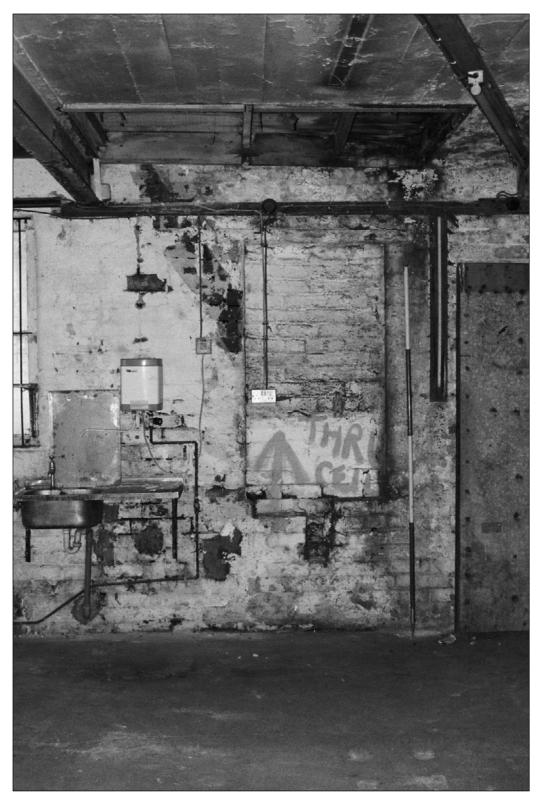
Detail of blocked window, stair scar and hatch in ceiling, west wall of F4, north range (film 24.32)
